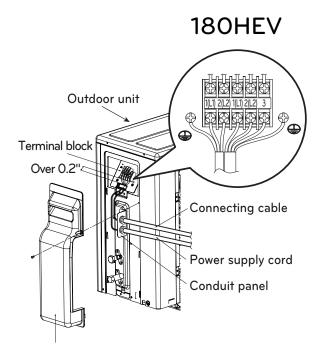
180HEV Outdoor Unit - Electrical Connections
